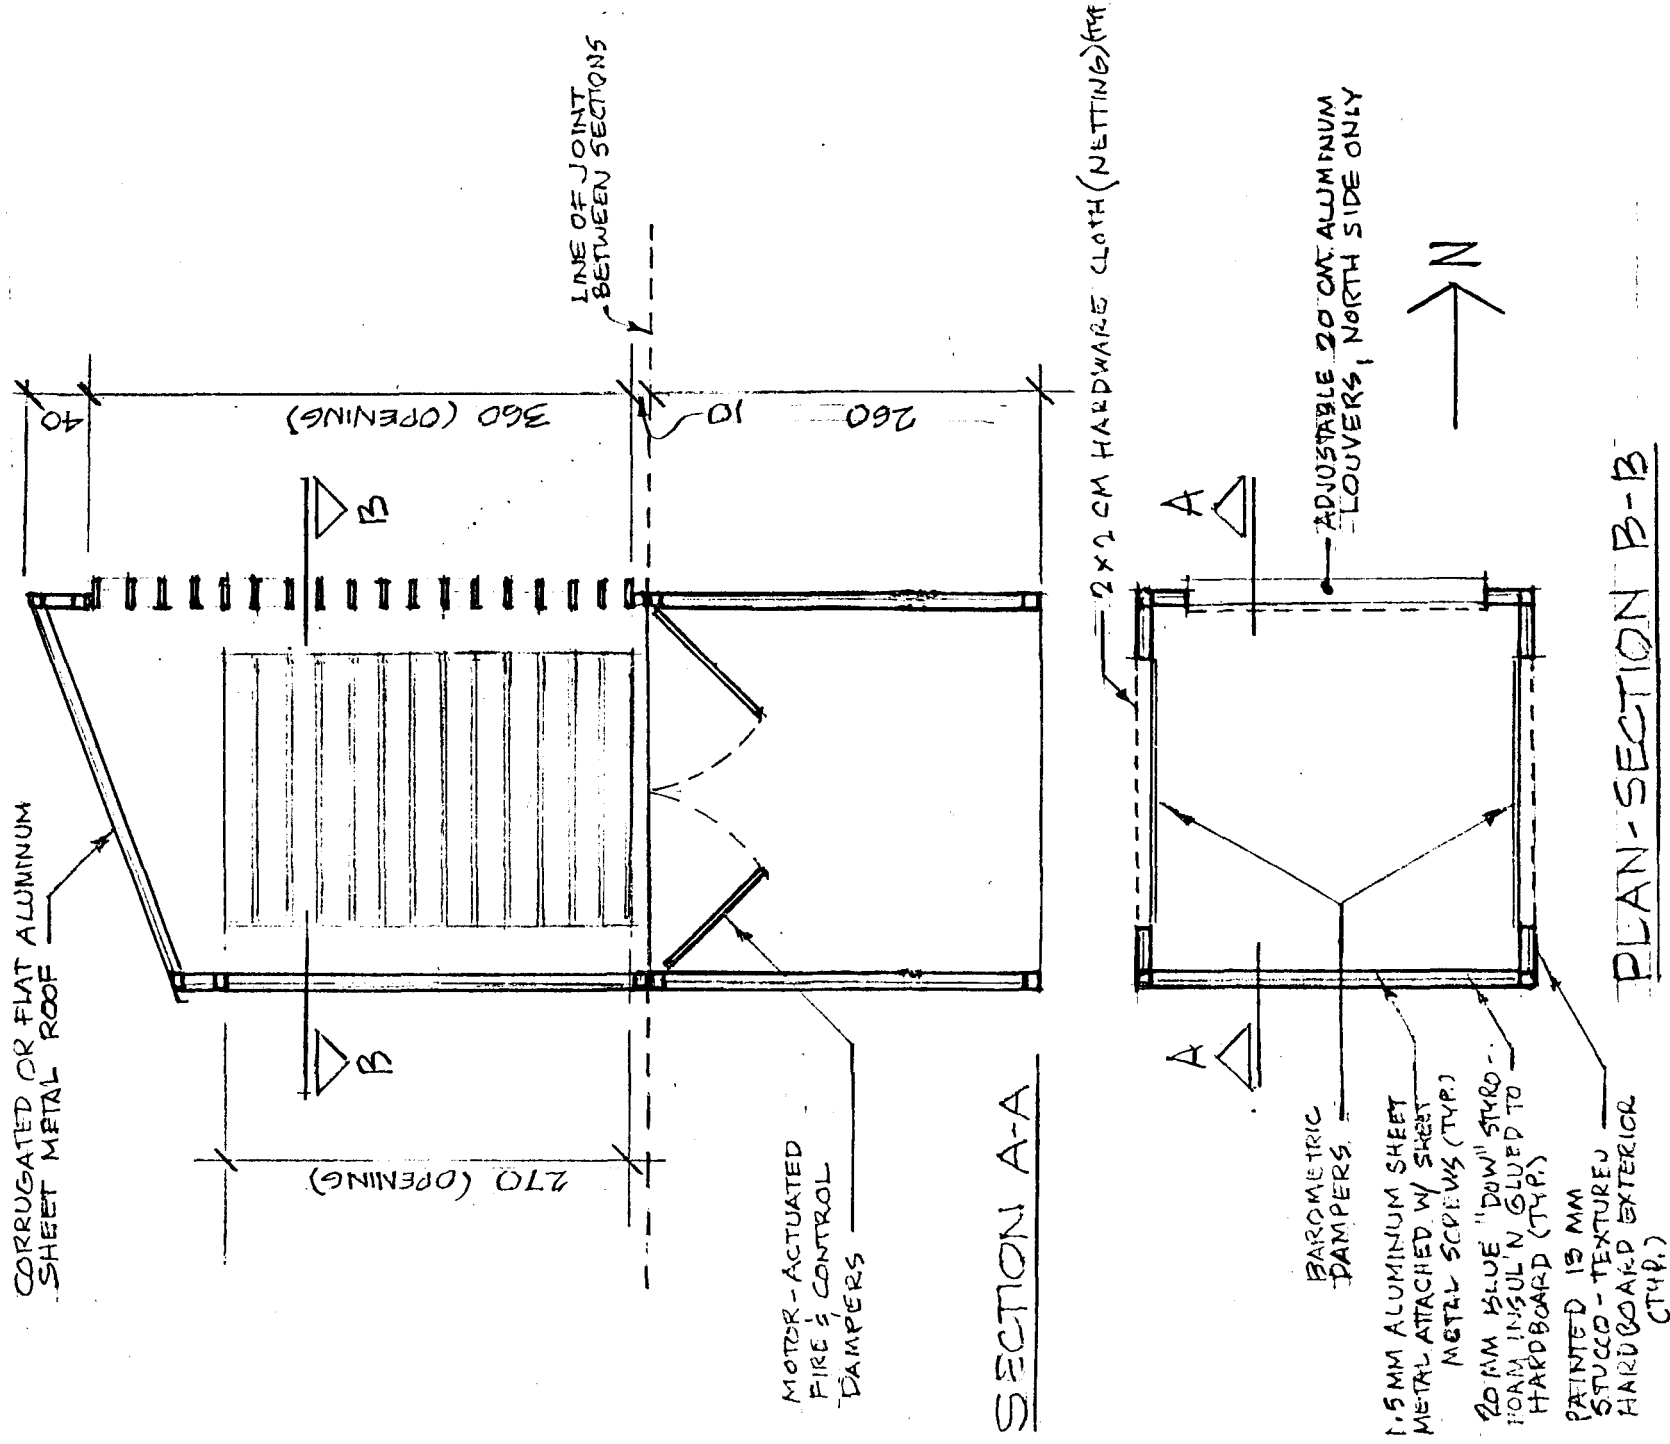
WIND TOWER (STEEL-FRAMED SECTION) ALT. #1
